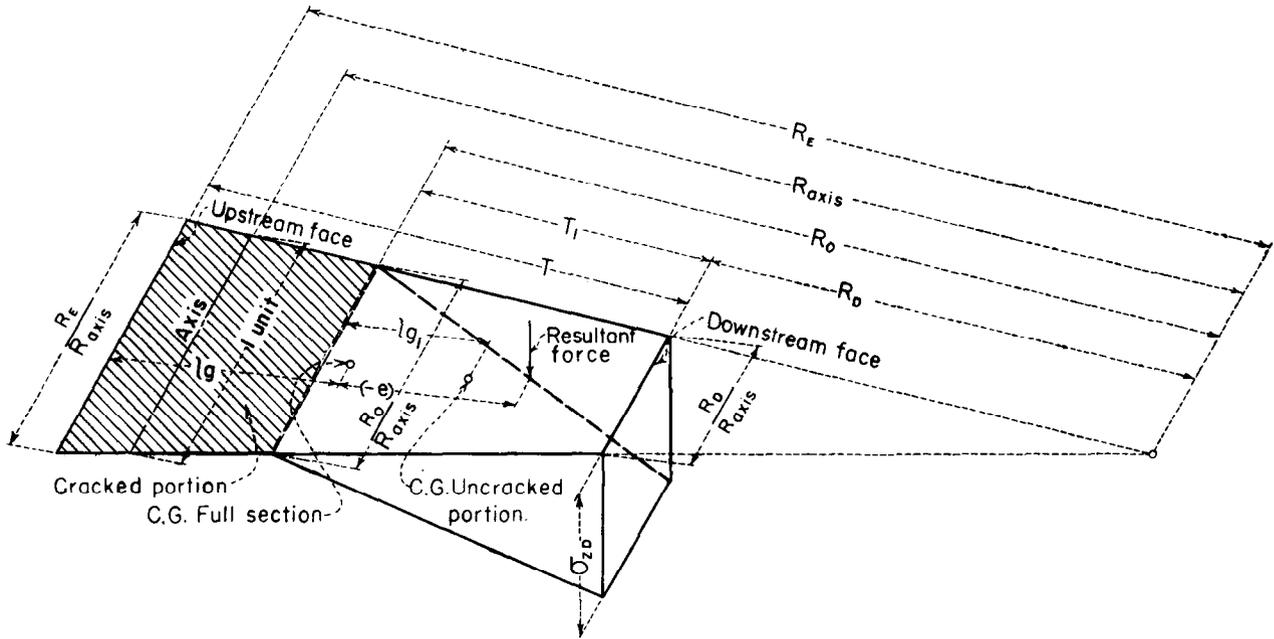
Horizontal section of a cantilever cracked from the upstream face (assuming linear stress distribution).—288-D-2977
